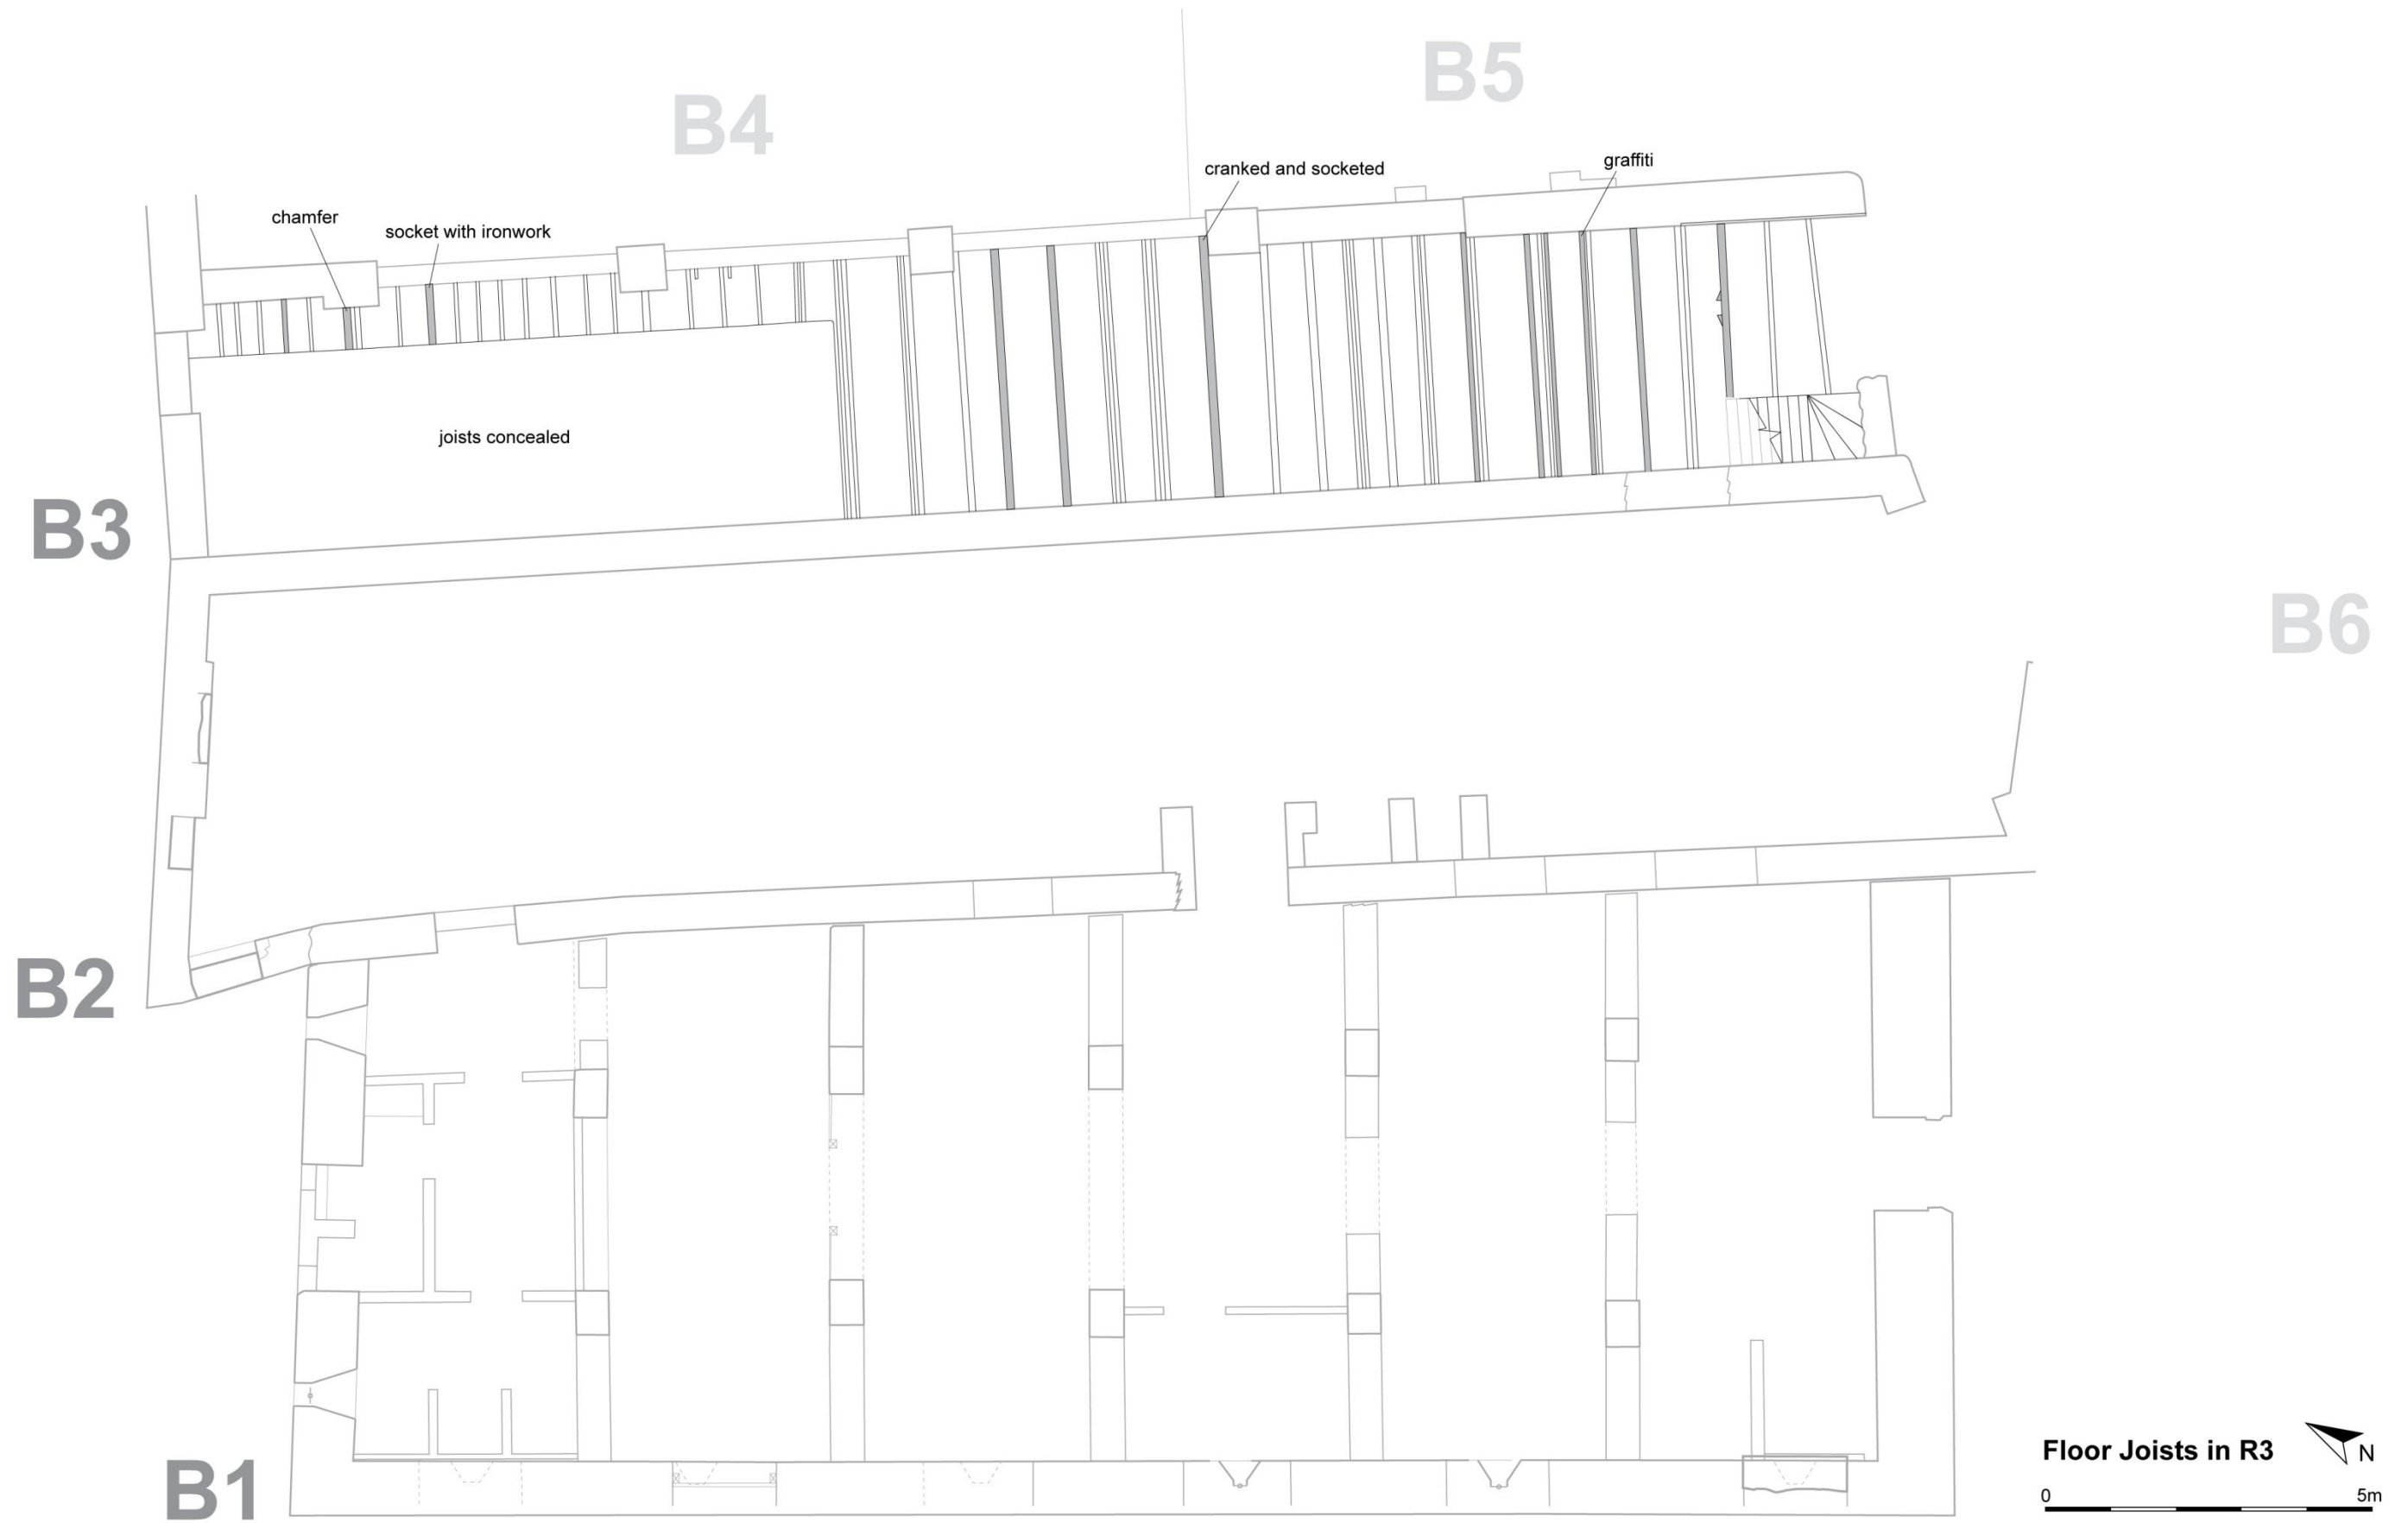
GROUND-FLOOR PLAN OF B1-B3 SHOWING THE CEILING JOISTS IN B3; THOSE IN GREY ARE REUSED SHIPS TIMBERS (MASTS) OR OTHERWISE NOTABLE.
